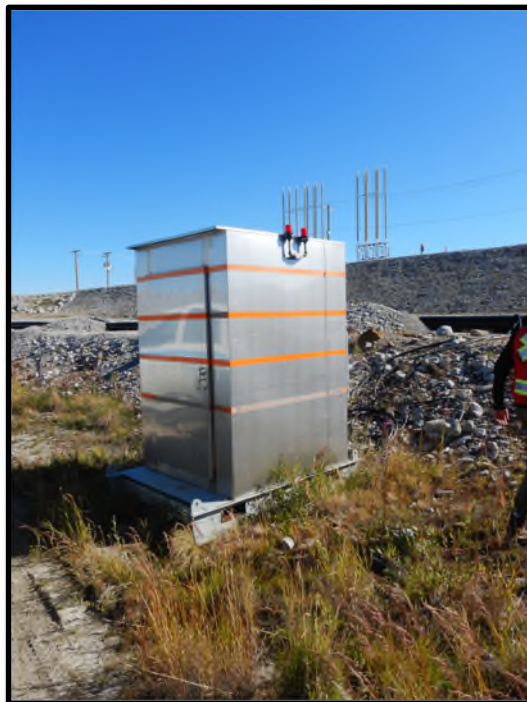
Electrical substation for submersible pump that pumps water from the pool near Station 0+070 to DPS-6.
